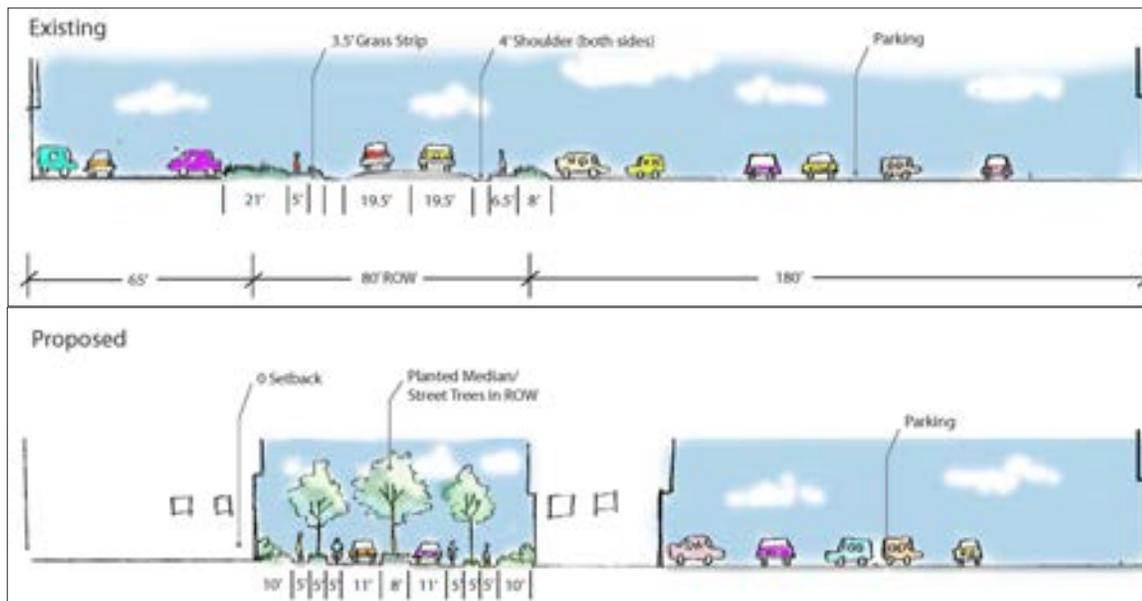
Figure P: Illustration of existing road cross section in Forest Road District (above) and cross section with altered zoning standards, bicycle amenities and landscaping (below, see page 129-138 for more).
